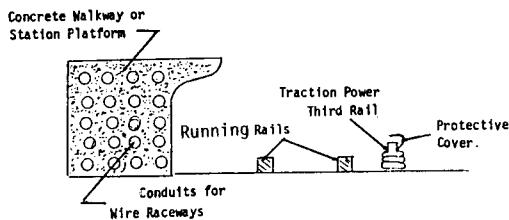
TYPICAL UNDERGROUND INSTALLATION OF WIRE AND CABLE
